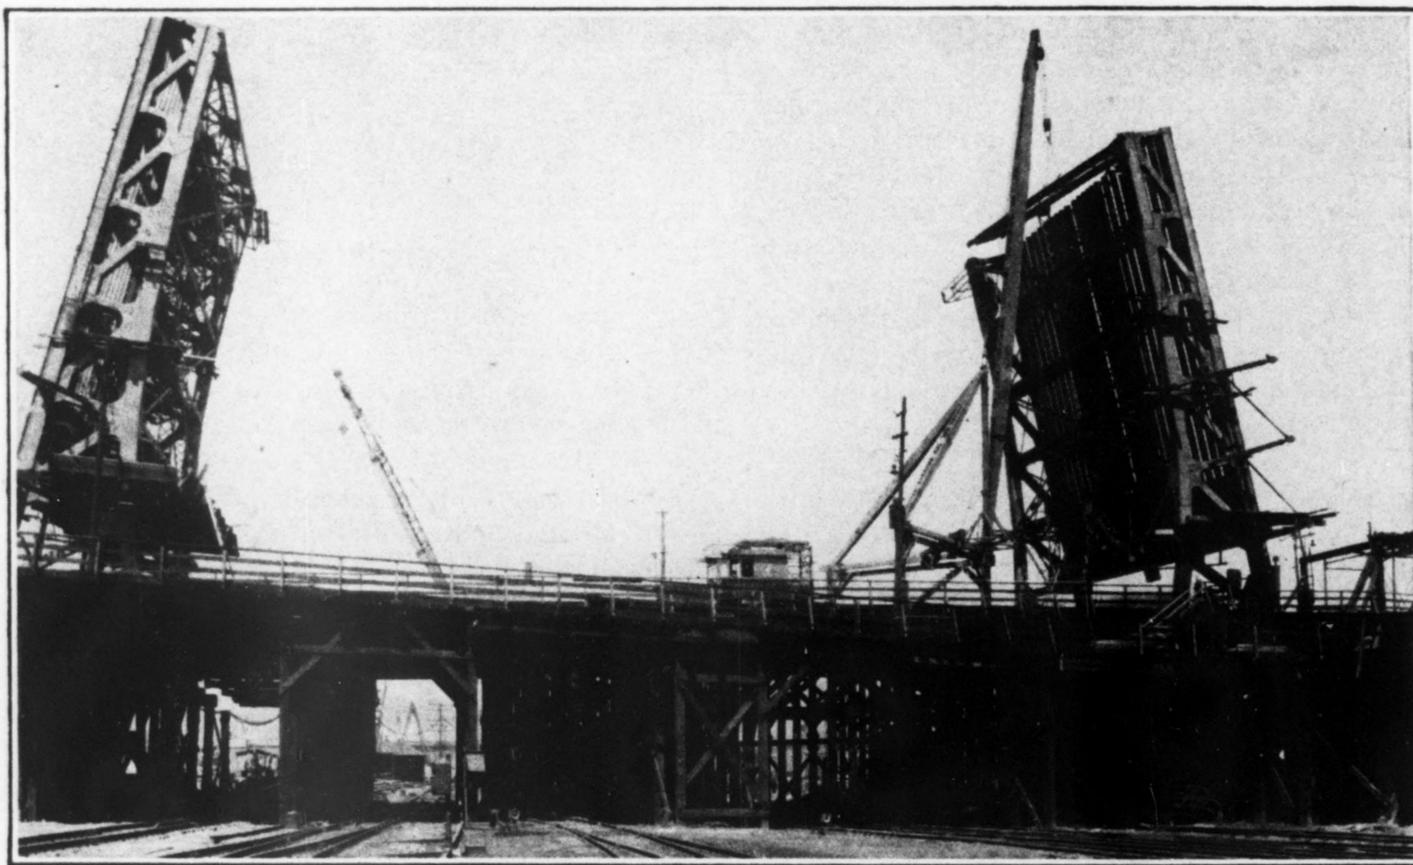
ROOSEVELT ROAD BASCULE BRIDGE, CHICAGO
